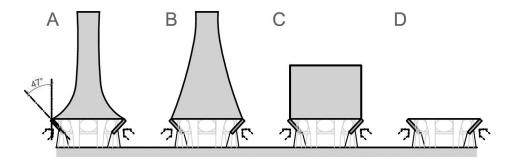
Tested shapes of ventilation chimneys with inlet towers
